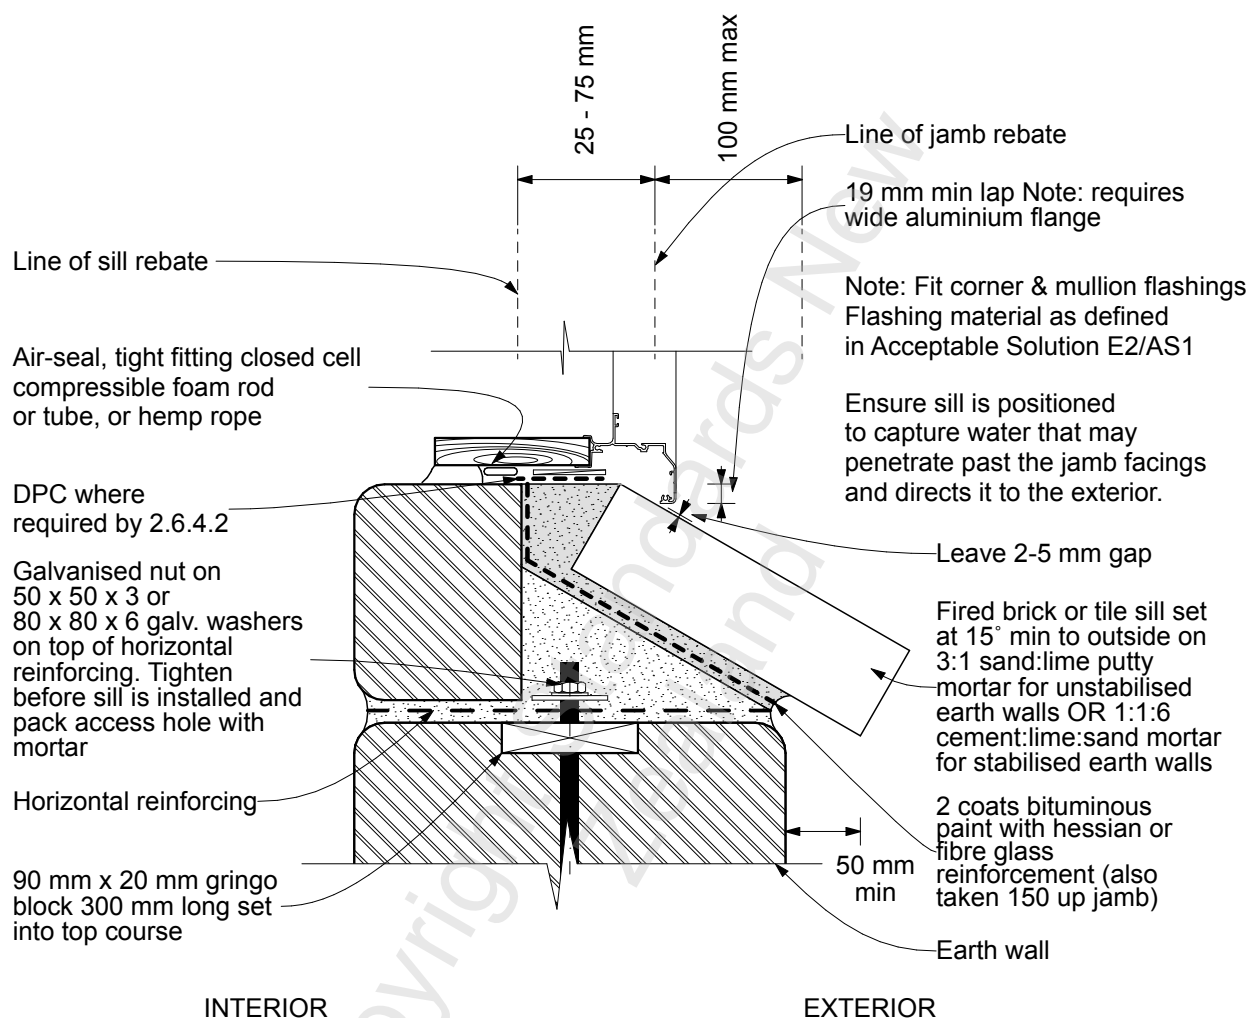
Windowsill – Aluminium joinery with brick or tile sill
